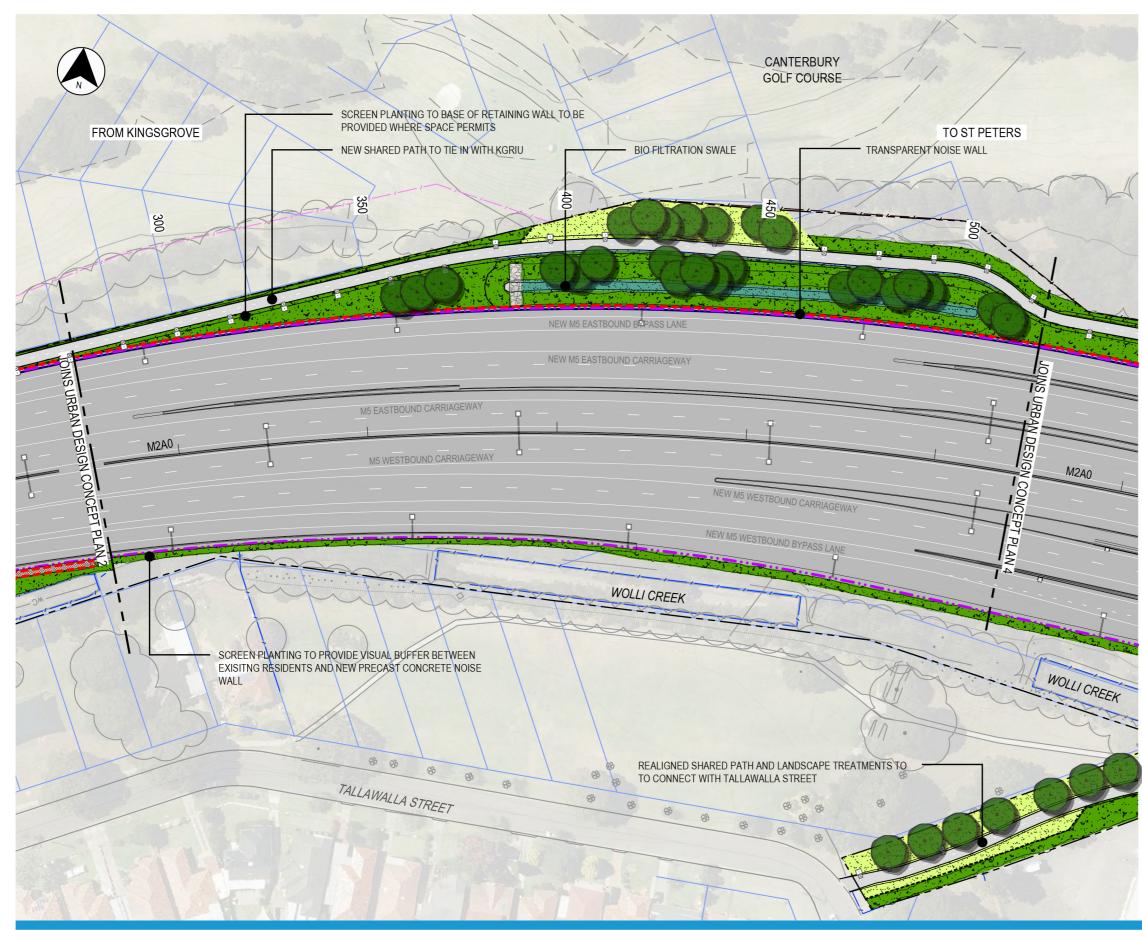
Western Interchange and Portals - Urban Design Concept Plan - Sheet 3 of 7 - 1:1000
